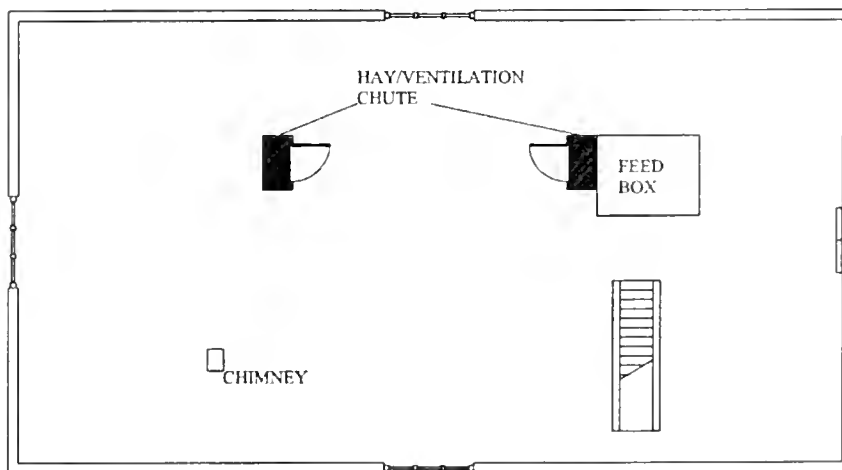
CARRIAGE HOUSE PLAN, 1999
